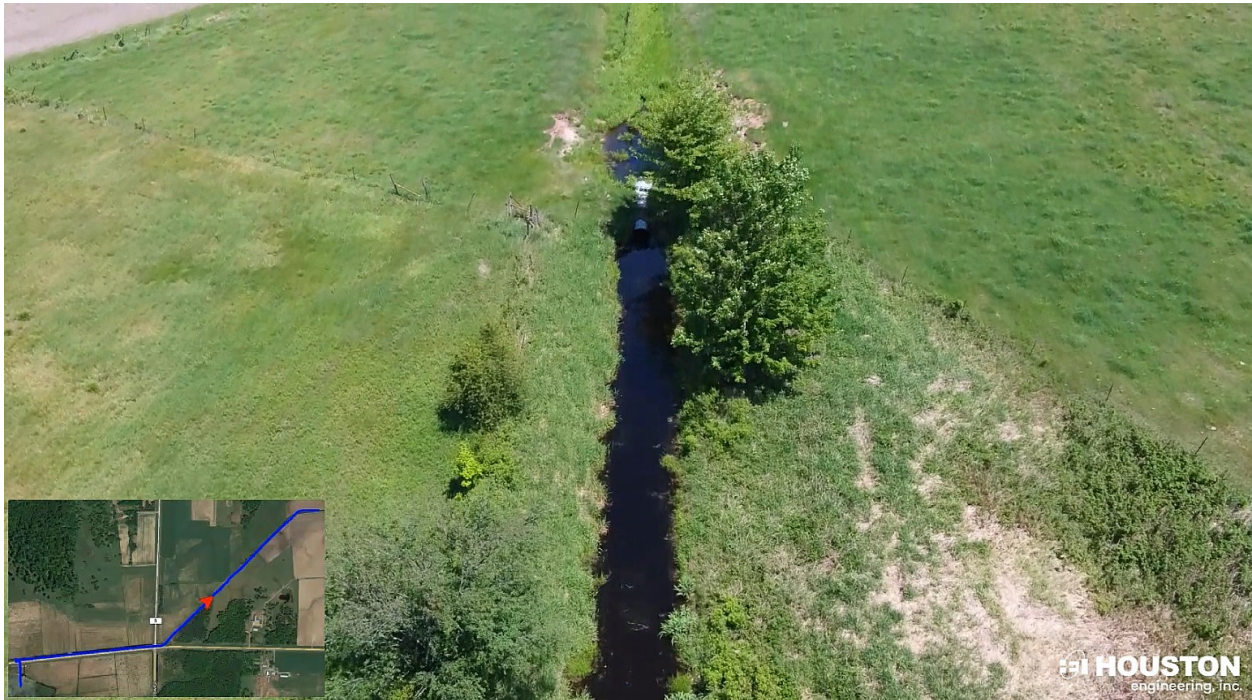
Branch 3 field crossing at STA 101+00 that is causing water to pool upstream.
